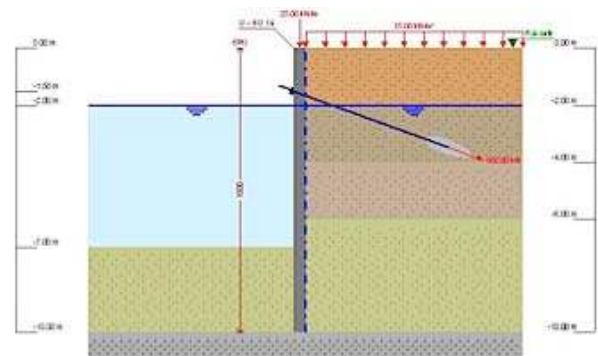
Design section for no water level difference for both sides of the sheet pile wall (anchor is schematic, not at scale)
